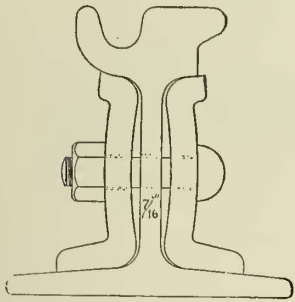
GROOVED GIRDER RAIL—WASHINGTON TYPE.
